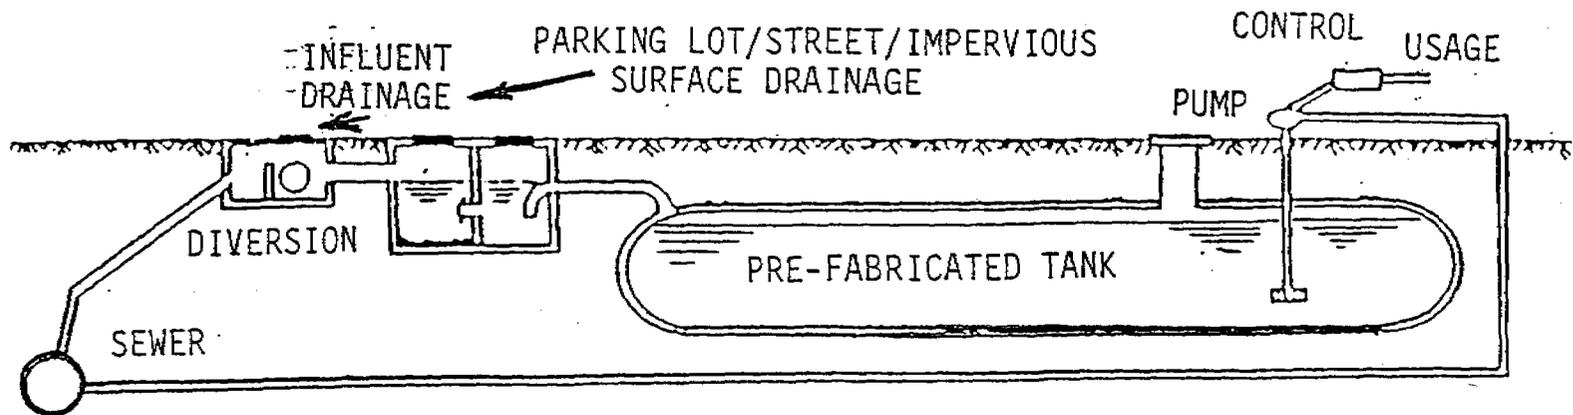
RAINFALL-RUNOFF WATER HARVESTING FACILITY FOR PARKING/STREET/IMPERVIOUS SURFACE DRAINAGE
